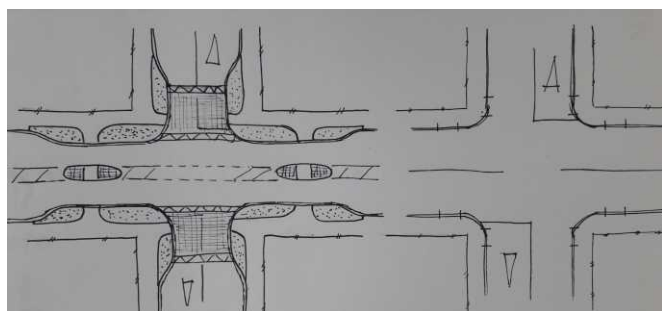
Traditional intersection layout and methods to improve pedestrian crossing
